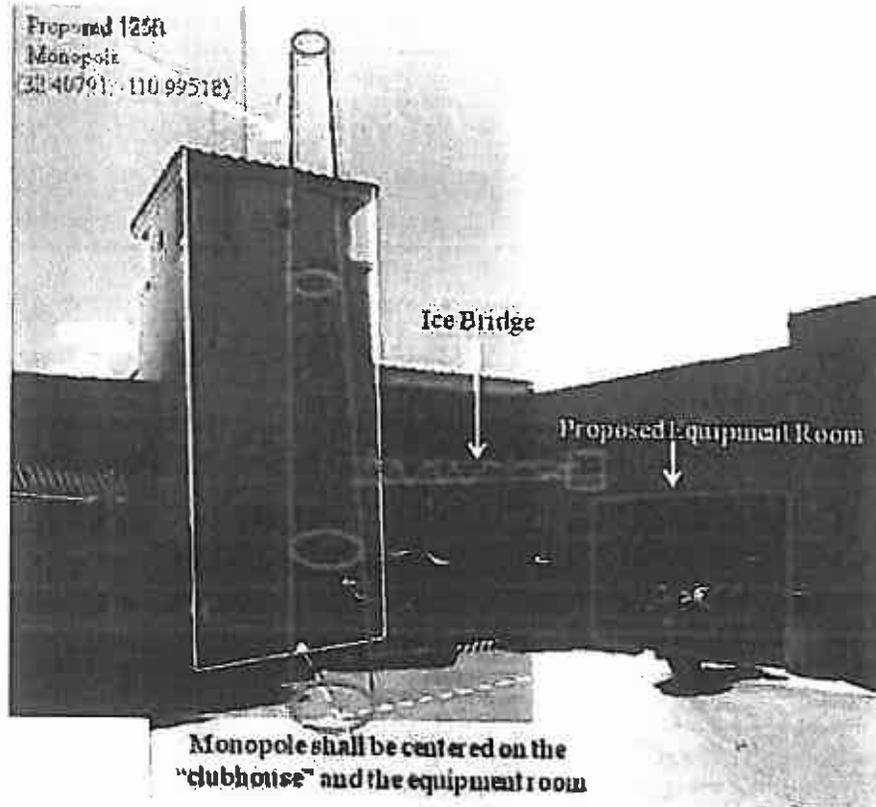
Oro Valley Police Department Proposed Equipment Room Location
